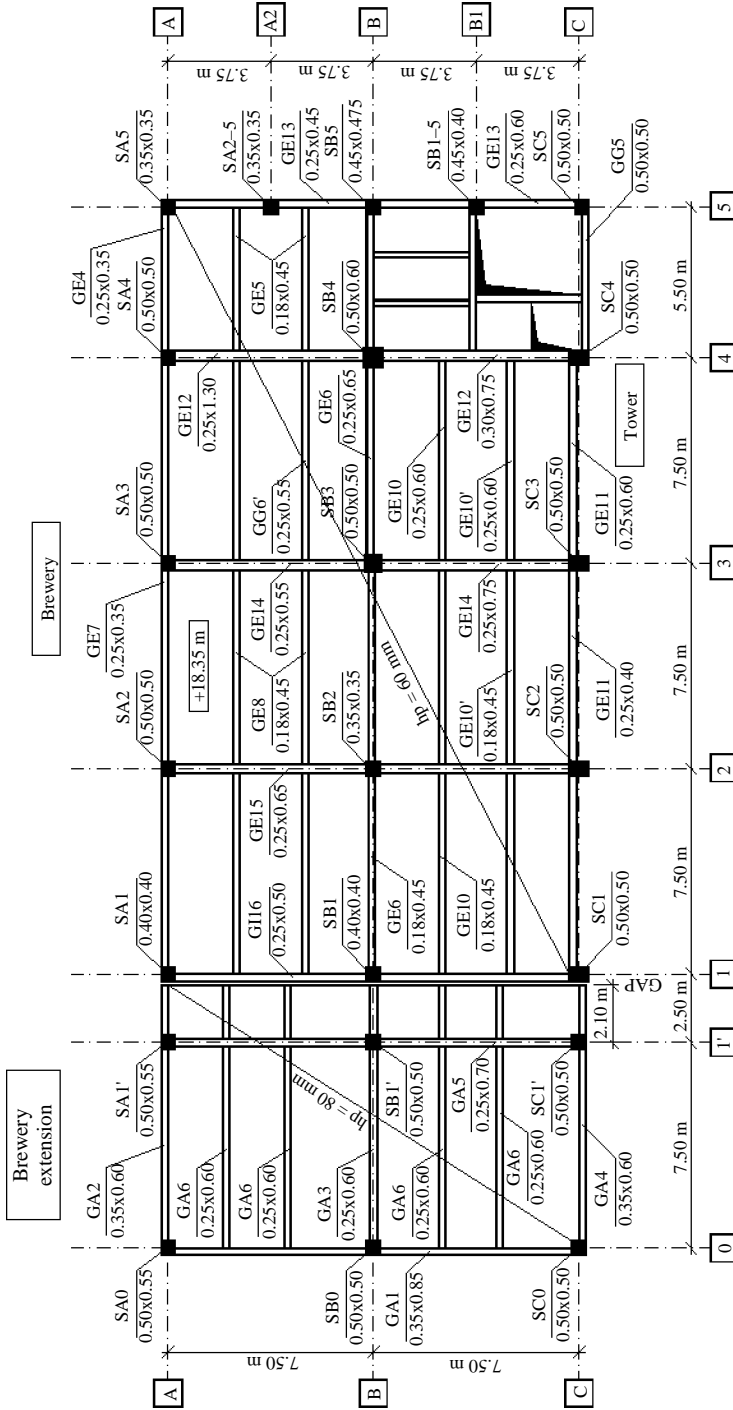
The Timisoreana Brewery—framing plan, level +18.40 m
